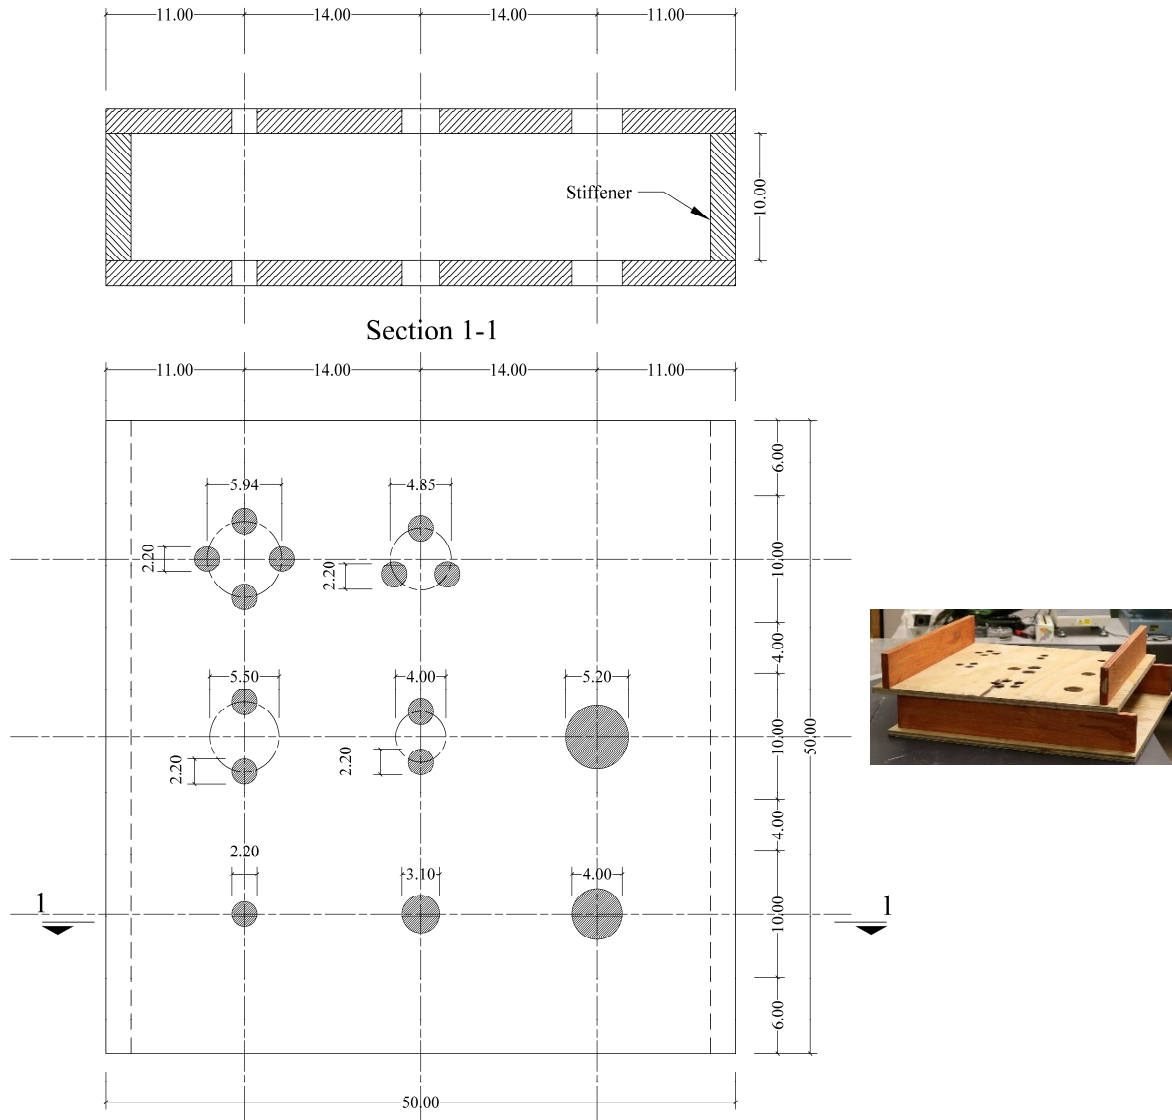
Template plate for stone columns installation for test T1-T4 (dimension in cm).
